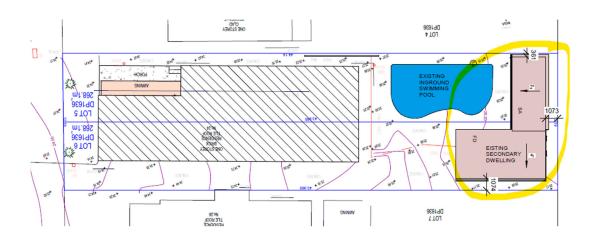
Extract of the architectural plans (site plan) showing the location of the subject outbuilding
